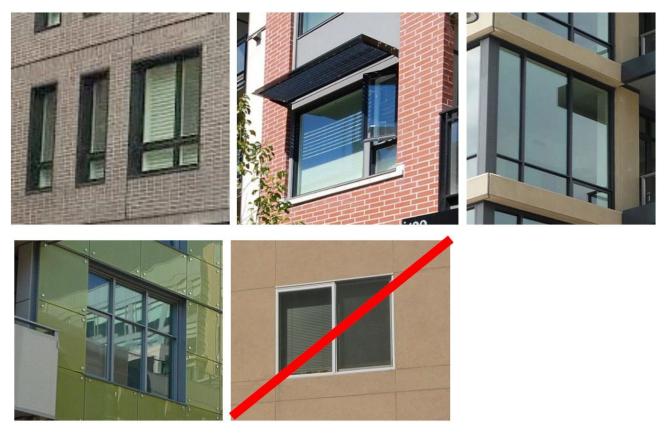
(A)(3) Examples of building material details that enhance the visual intrigue of the building.
